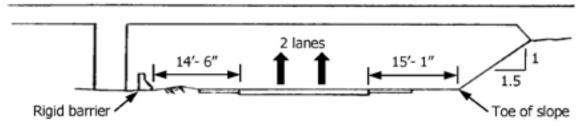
Bridge elevation view of horizontal clearances for a 2-lane, 1-way highway feature below the bridge, with a rigid barrier.
